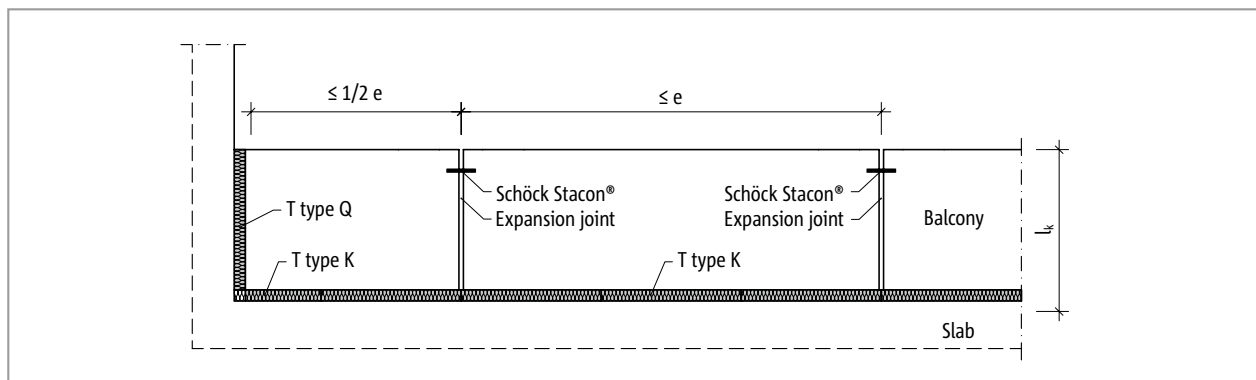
Schöck Isokorb® T type K: Expansion joint layout
